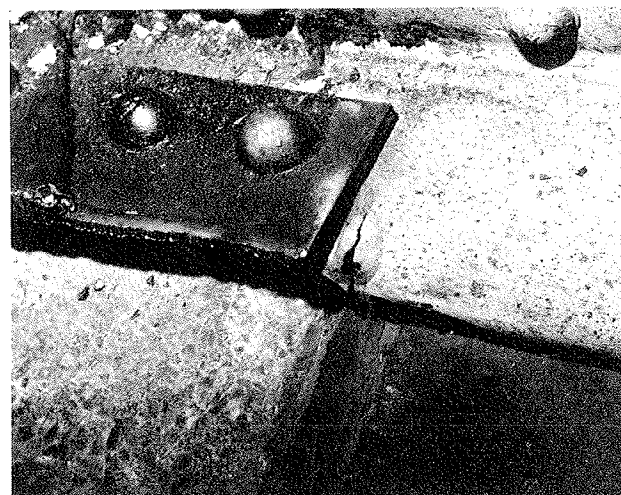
Preexisting crack in compression flange next to bracing connections.
